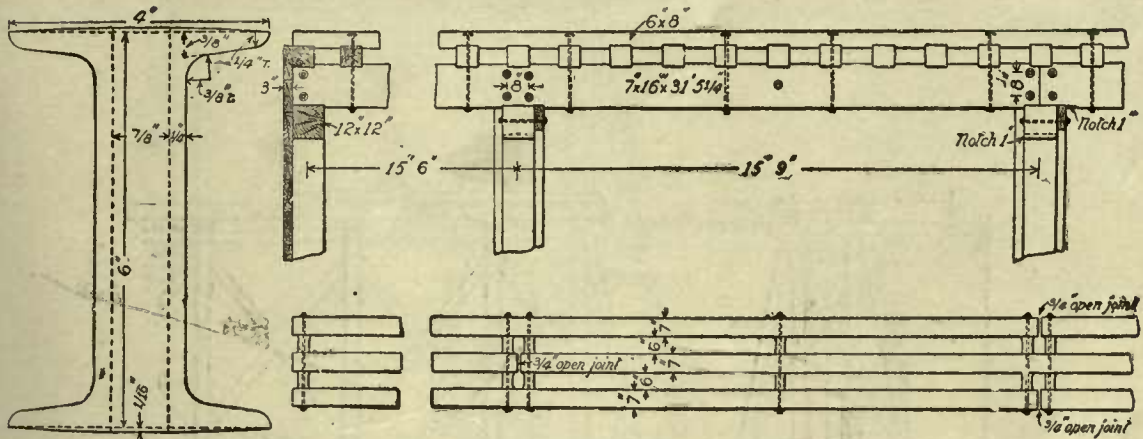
PLATE XII.—STANDARD FRAMED TRESTLE, SAN FRANCISCO & NORTH PACIFIC RAILROAD.
